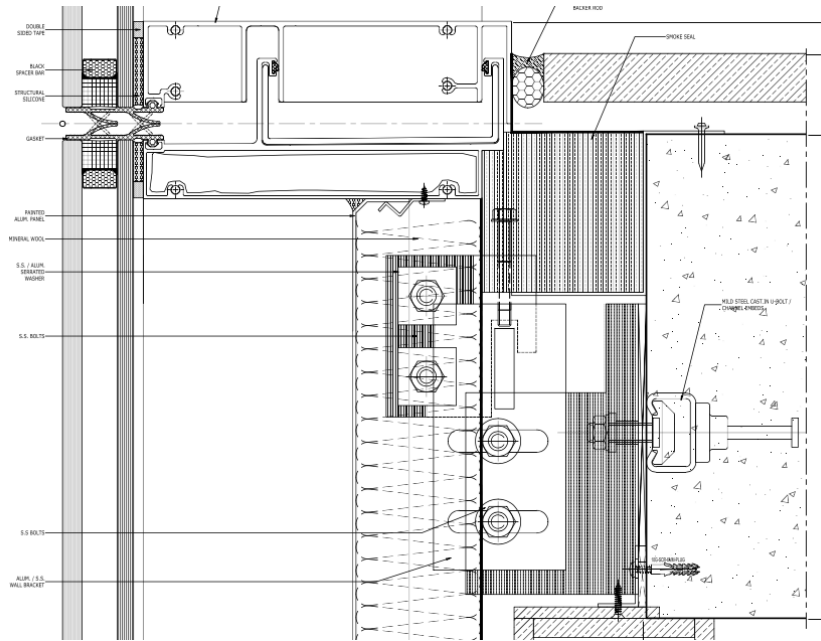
Facade interface detail with structural slab - consultant's detail (Author)
